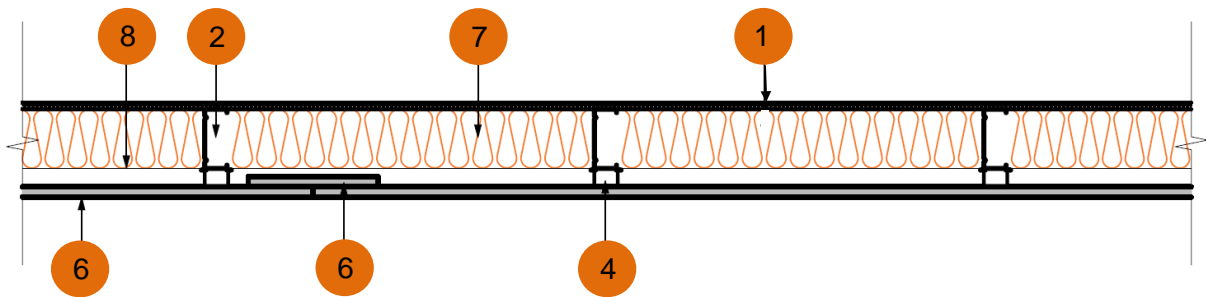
Horizontal INEX>RENDERBOARD Wall System Steel Frame – Plan Section
